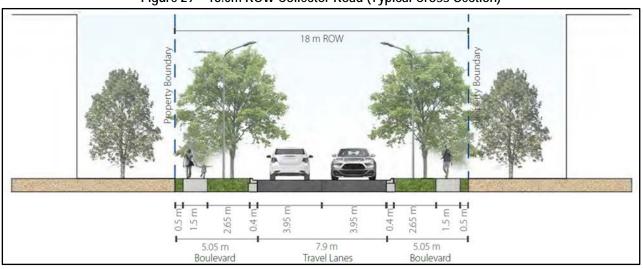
18.0m ROW Collector Road (Typical Cross-Section)
